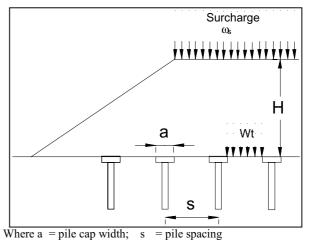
Piled embankment incorporating horizontal reinforcement above pile caps,
